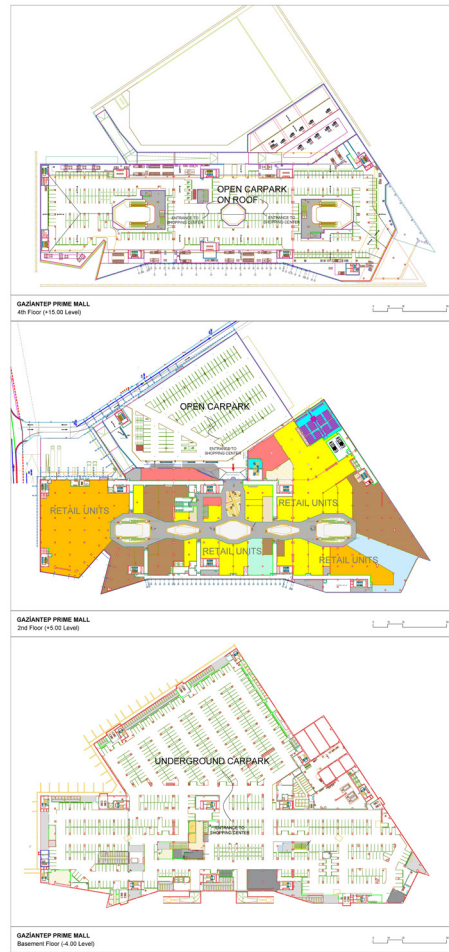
Plan layouts of primemall Gaziantep (Basement, Second, Fourth Floors)
